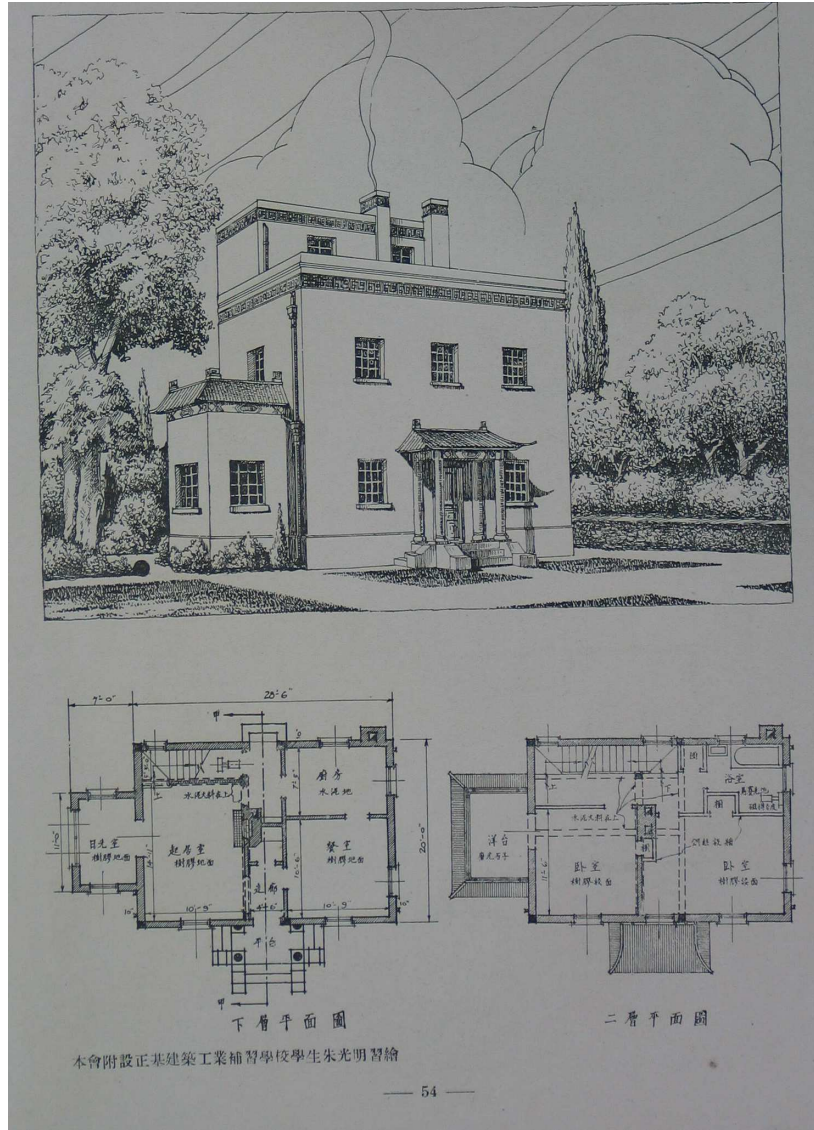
“Practice design by Zhu Guangming,” a student at the architectural school affiliated with the Builders Association (Source: *The Builder* 2.9 (1934):54)
